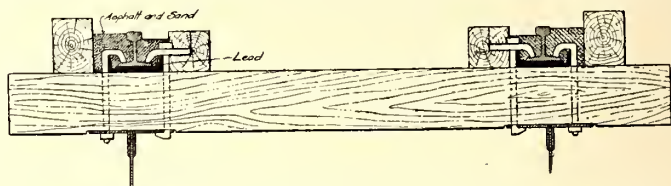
MANHATTAN EXPERIMENT, SHOWING RAILS SURROUNDED WITH ASPHALT AND RESTING UPON LEAD STRIPS CARRIED IN STEEL CHANNELS
